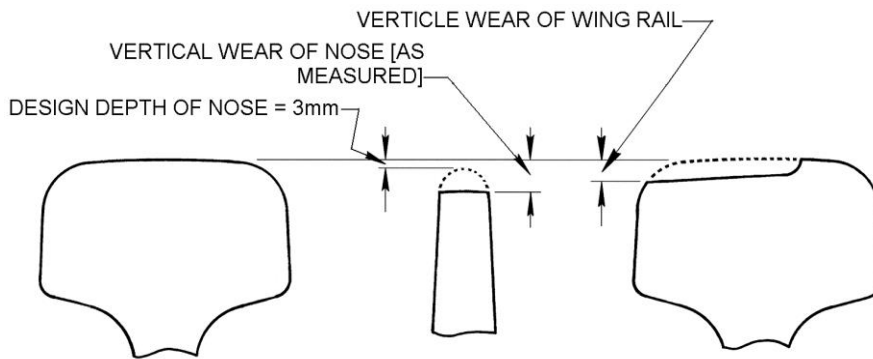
Part section through "V" crossings (shown for fabricated type)
